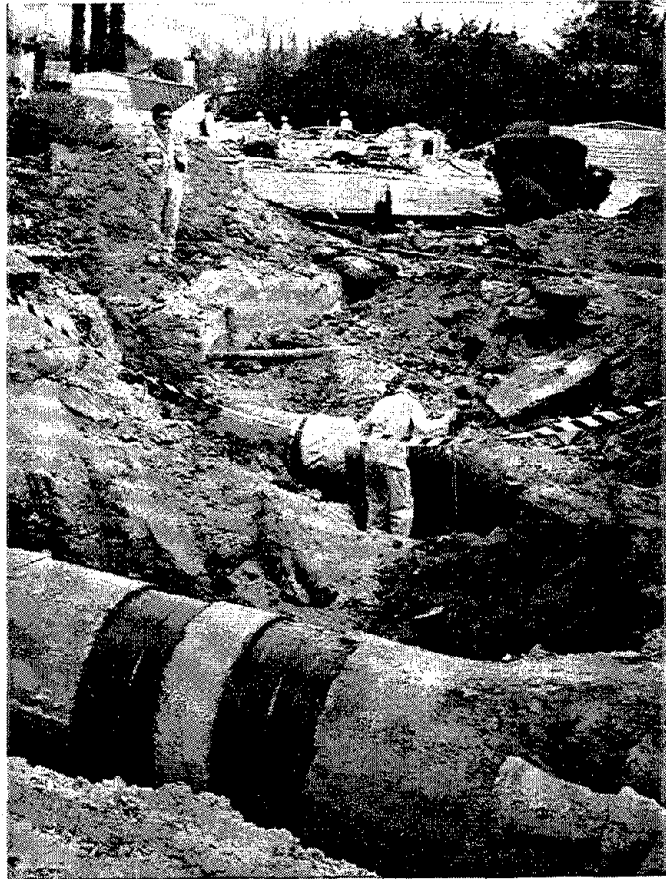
Damaged pipes under Balboa Blvd. south of Lorillard St. in tension zone.
